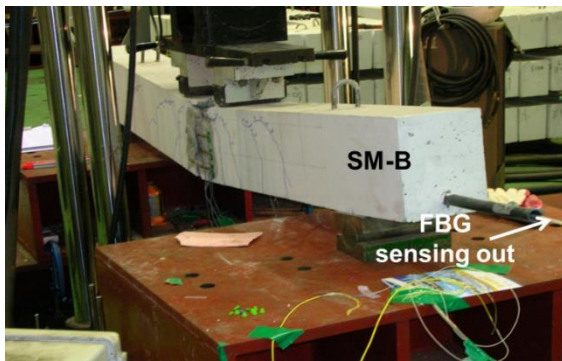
Flexural failure of SMFRP bar reinforced concrete beam
